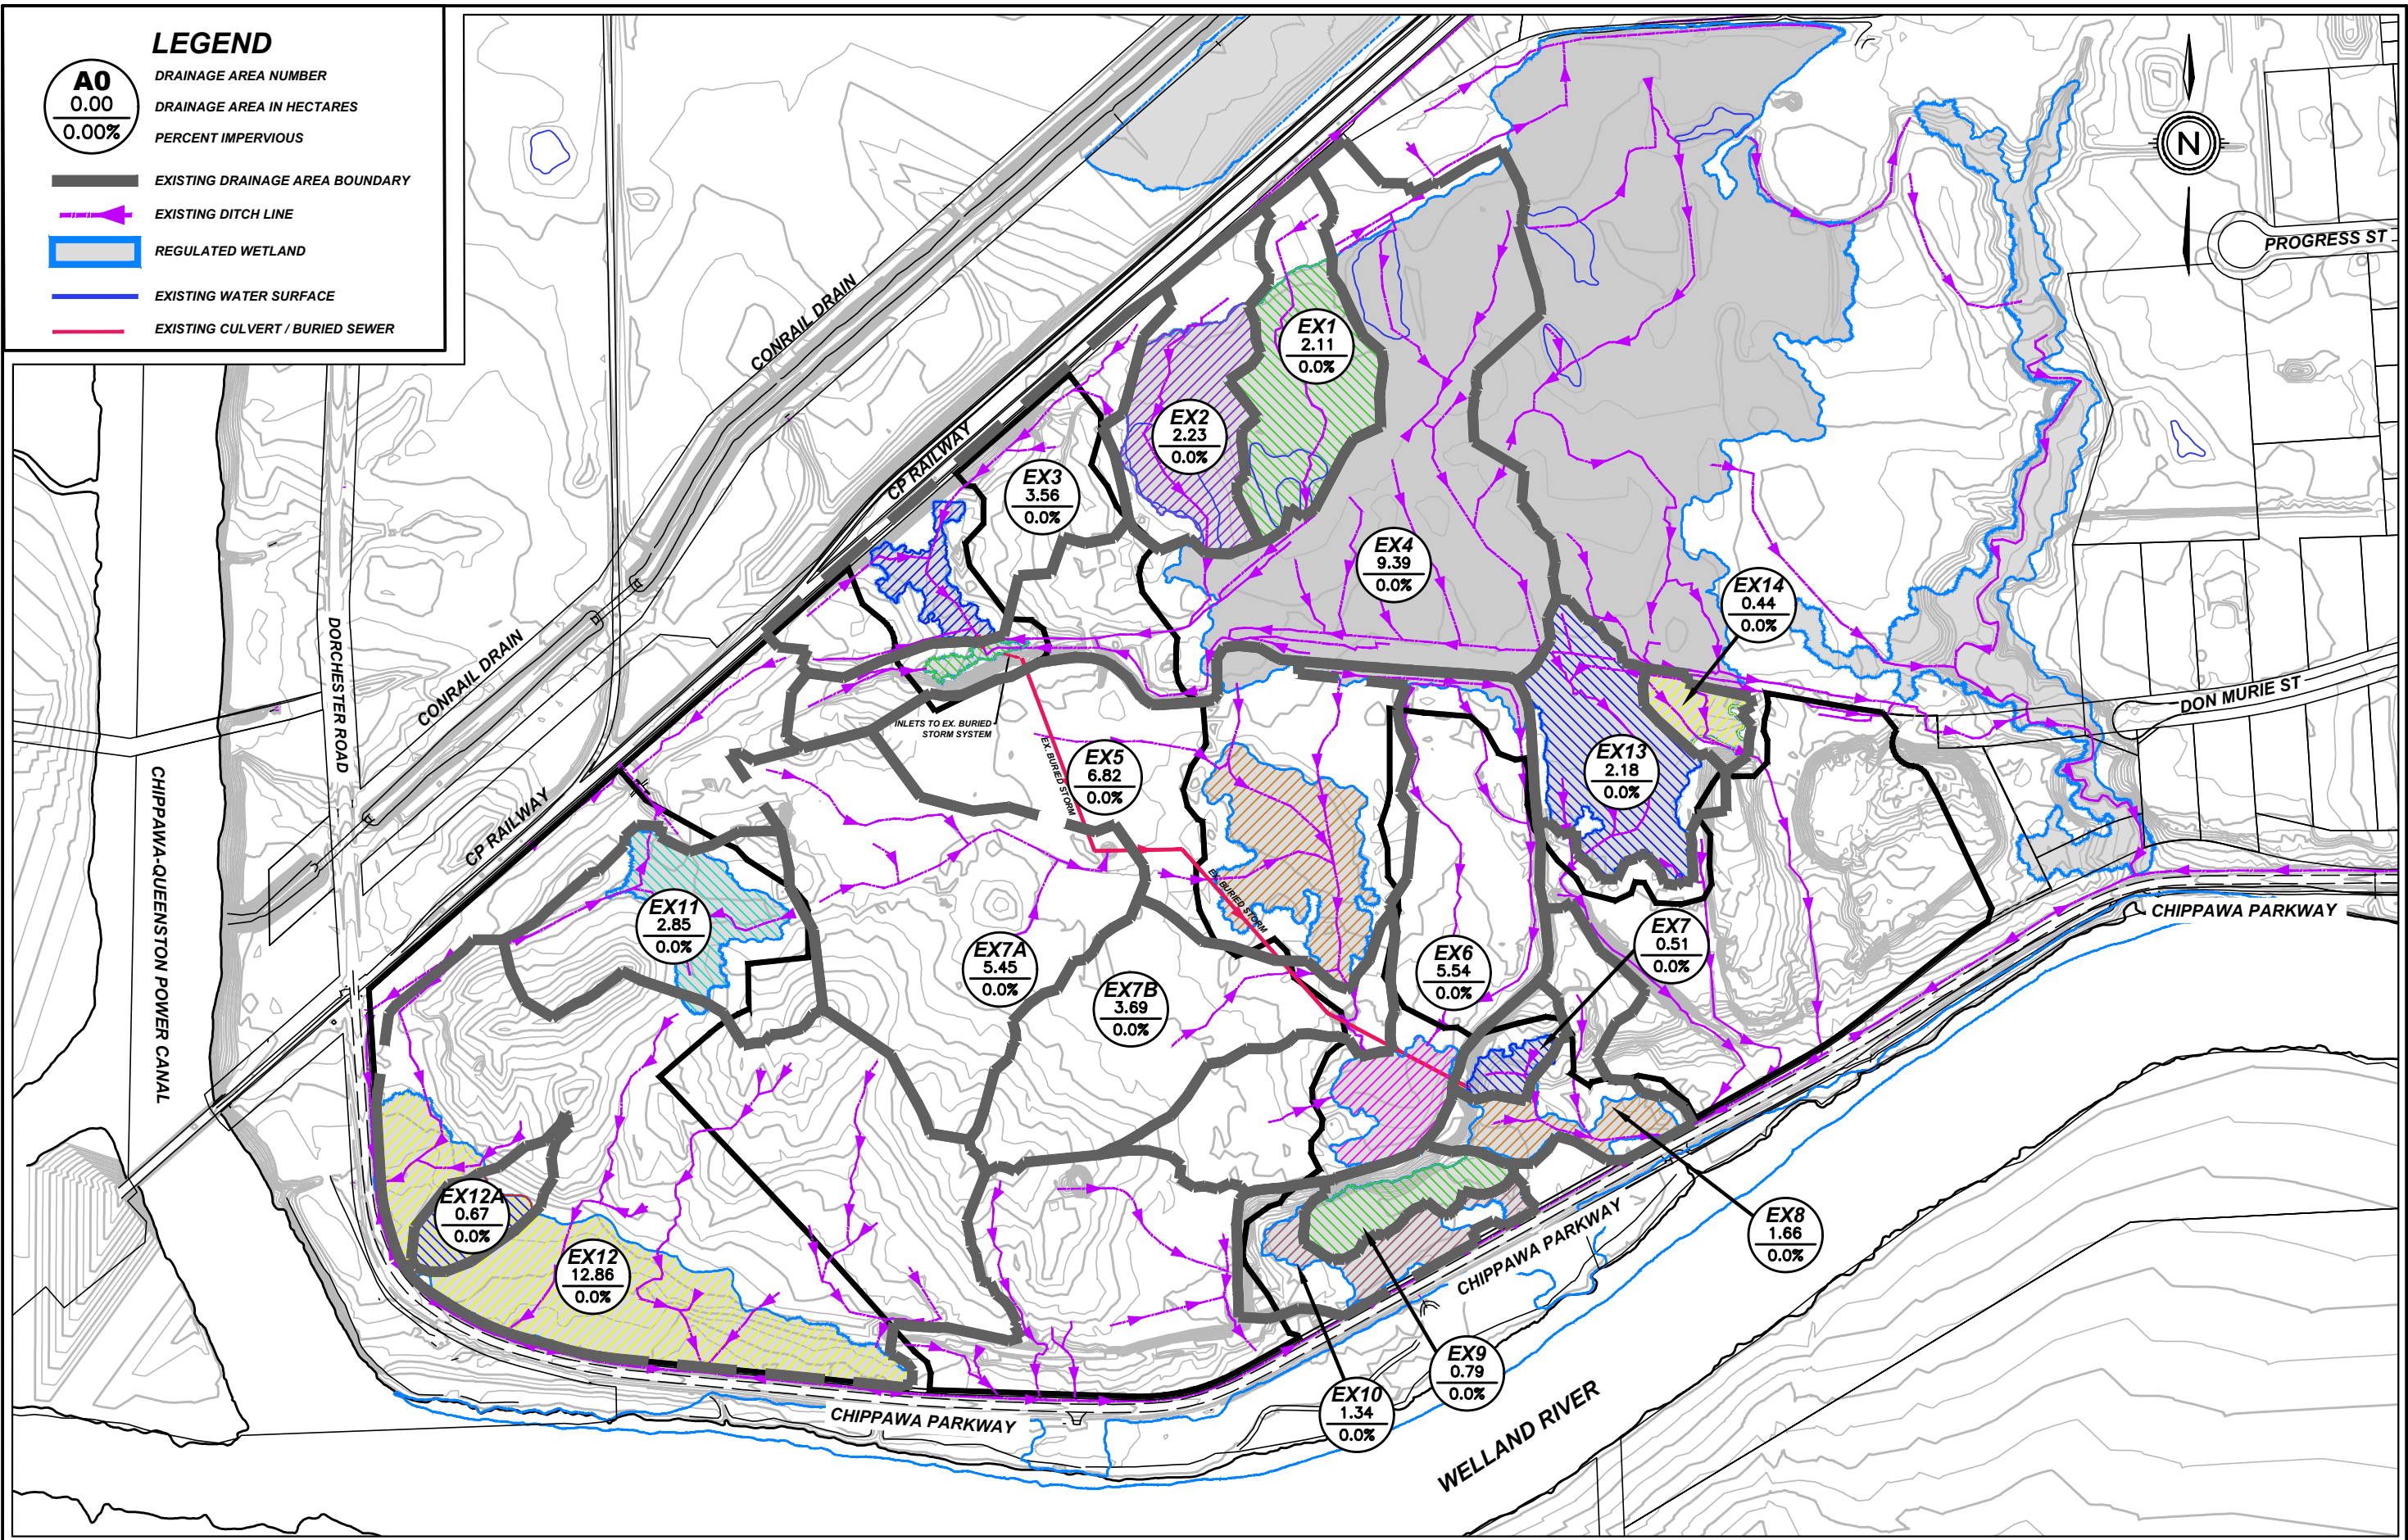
Schematic of Existing Wetland Drainage Area Plan
